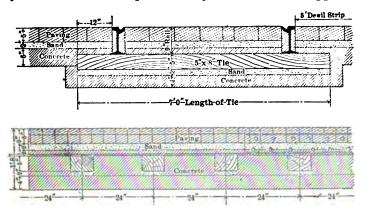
Track Construction Used in Cleveland, Ohio.
